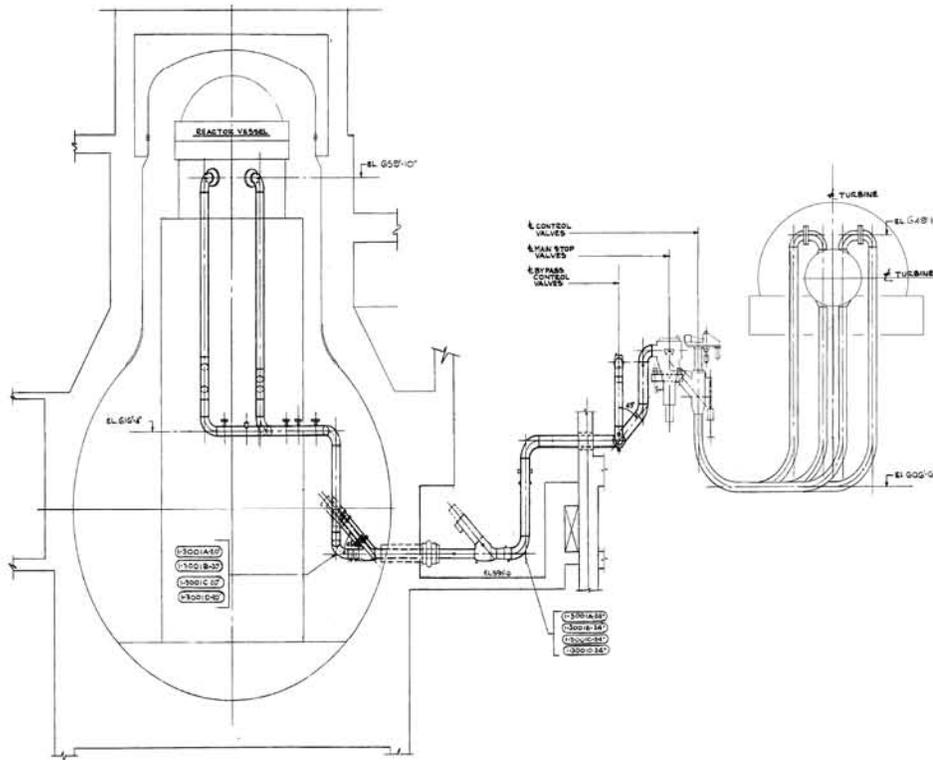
Typical Main Steam Line Layout Between RPV and Turbine (elevation view)
